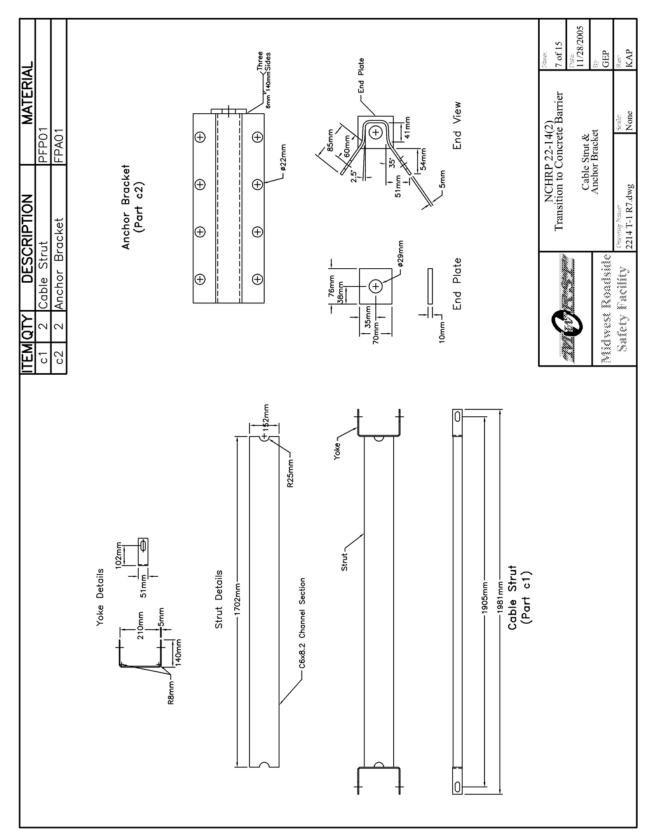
Approach Guardrail Transition to Concrete Barrier Design - Anchorage Details
